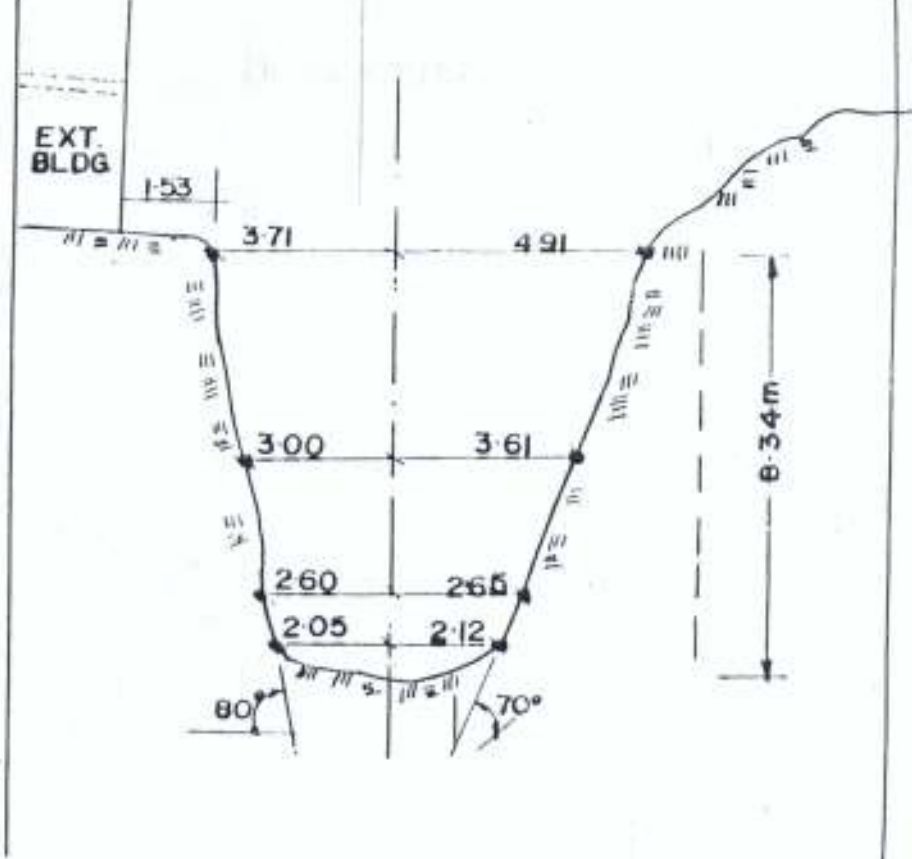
TYPICAL CROSS SECTION OF IGBO EGUN GULLY
